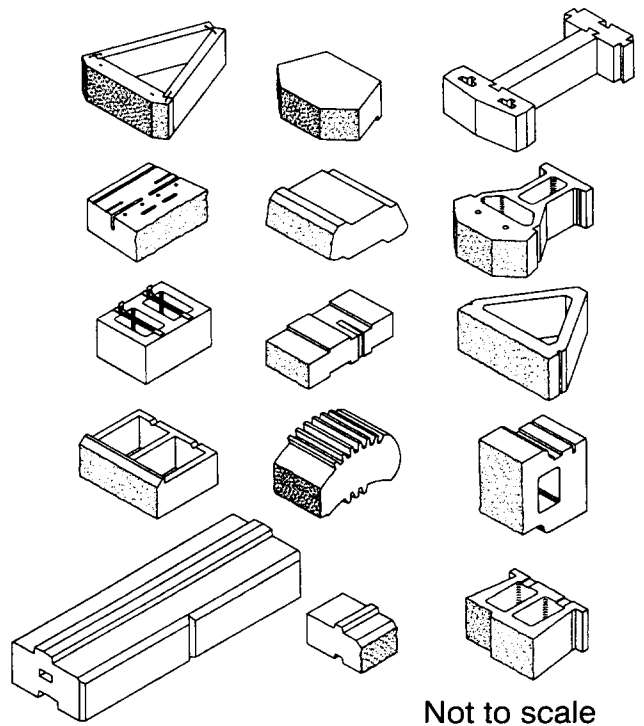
Examples of some segmental retaining wall units (NCMA 1997)
